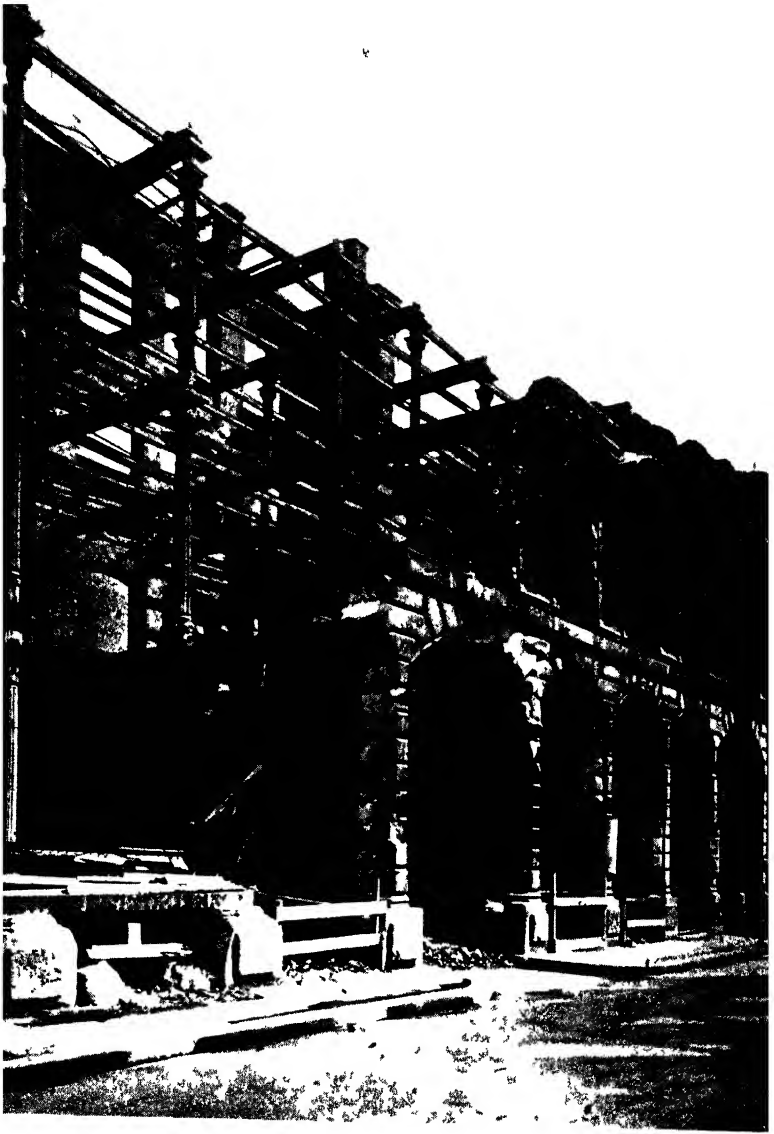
Cast iron columns used in the internal structure of a building erected about 1820. This was *The Swan with Two Necks*, in Gresham Street, London, damaged in air raids
